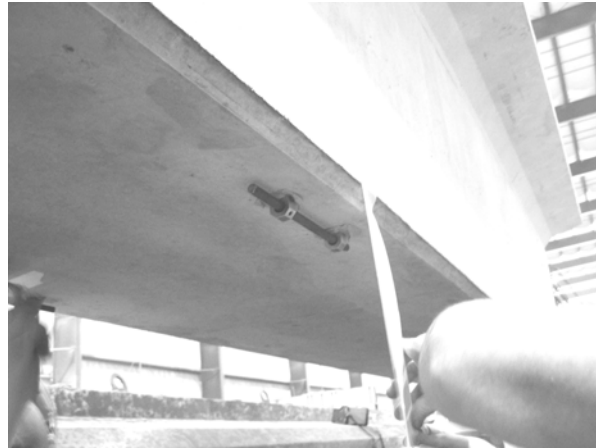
VSM-4000 mounted to girder (Bennett 2004).
